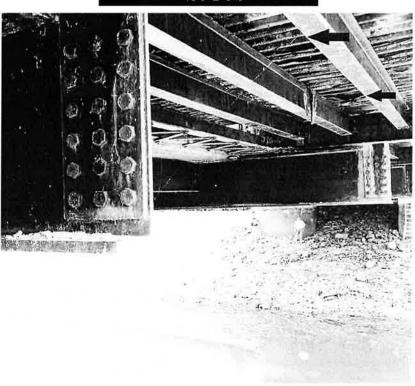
SIP forms, underside of south sidewalk in span 2, panel 2 (between floorbeams 2 and 3), looking east - heavy rust with isolated holes and heavy efflorescence leakage.
